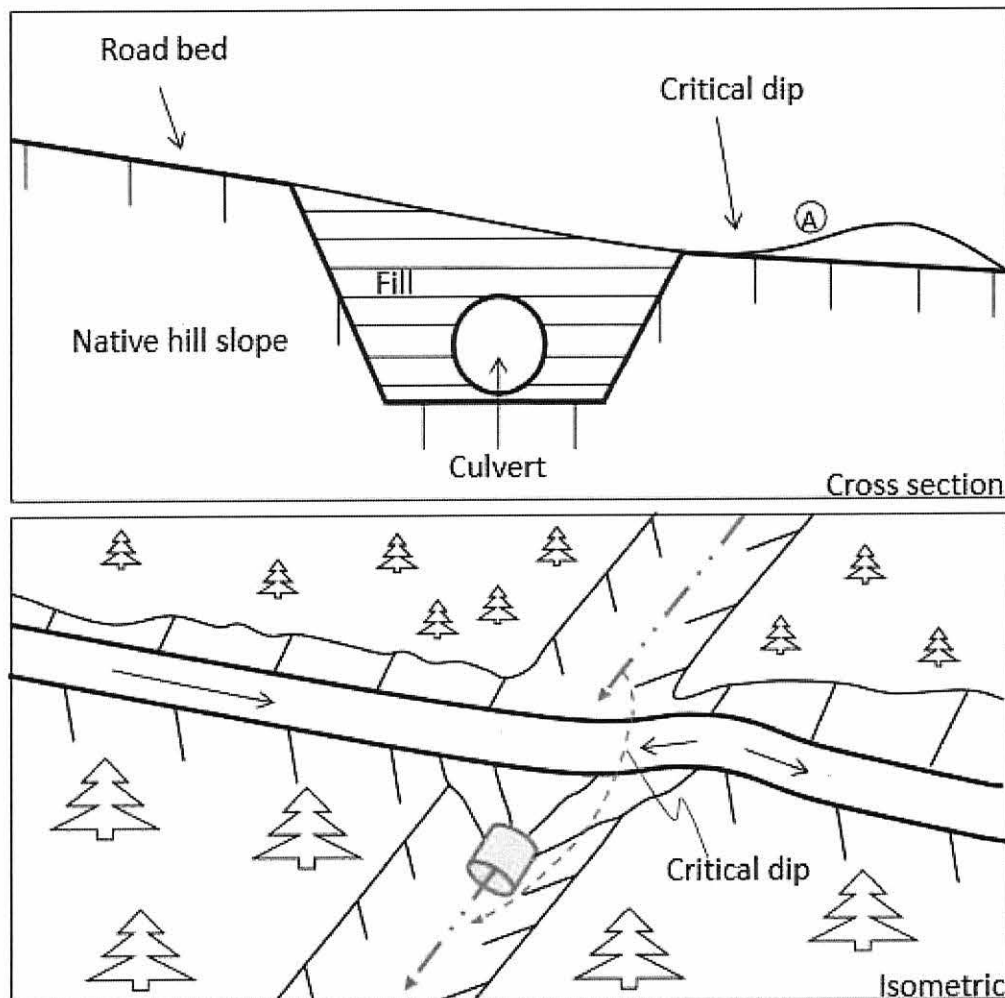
Critical dips or dipped crossing fills should be centered near a stream crossing's down-road hingeline, not over the centerline of the crossing where overtopping could cause washout or severe erosion of the fill. If the stream crossing culvert (B) plugs, water will pond behind the fill until reaching the critical dip or low point in the crossing (C) and flowing back down into the natural stream channel. The down-road ditch must be plugged to prevent streamflow from diverting down the ditch line. For extra protection in this sketch, riprap armor has been placed at the critical dip outfall and extending downslope to the stream channel. This is only required or suggested on stream crossings where the culvert is highly likely to plug and the crossing fill overtopped. The dip at the hinge line is usually sufficient to limit erosional damage during an overtopping event. Road surface and ditch runoff is disconnected from the stream crossing by installing a rolling dip and ditch relief culvert just up-road from the crossing (A) (Keller and Sherar, 2003).
